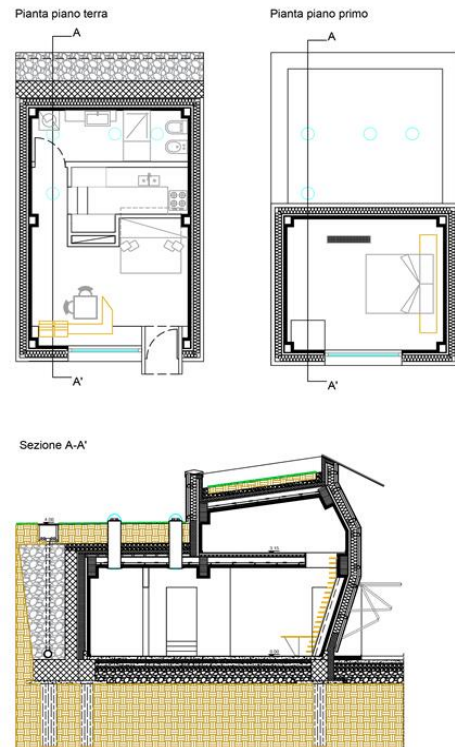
Plans and vertical cross section of the dwellings of 35 m².
